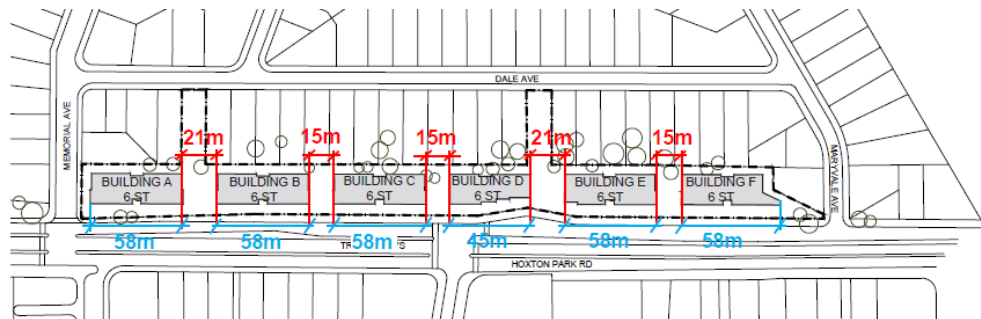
Overview of site layout including building separation and building width. Source: Architectural plans by Tony Owen Partners
